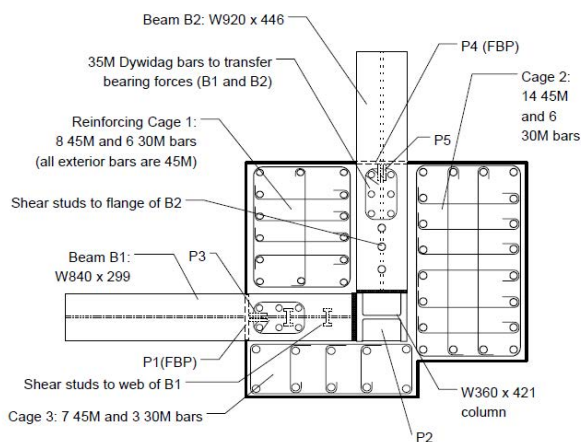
Composite Column Section Example from Norwest Center in Minneapolis
